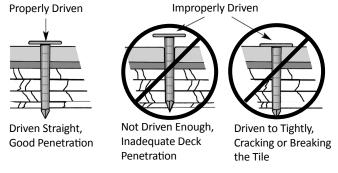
Proper Nailing Techniques for Plywood Decks
